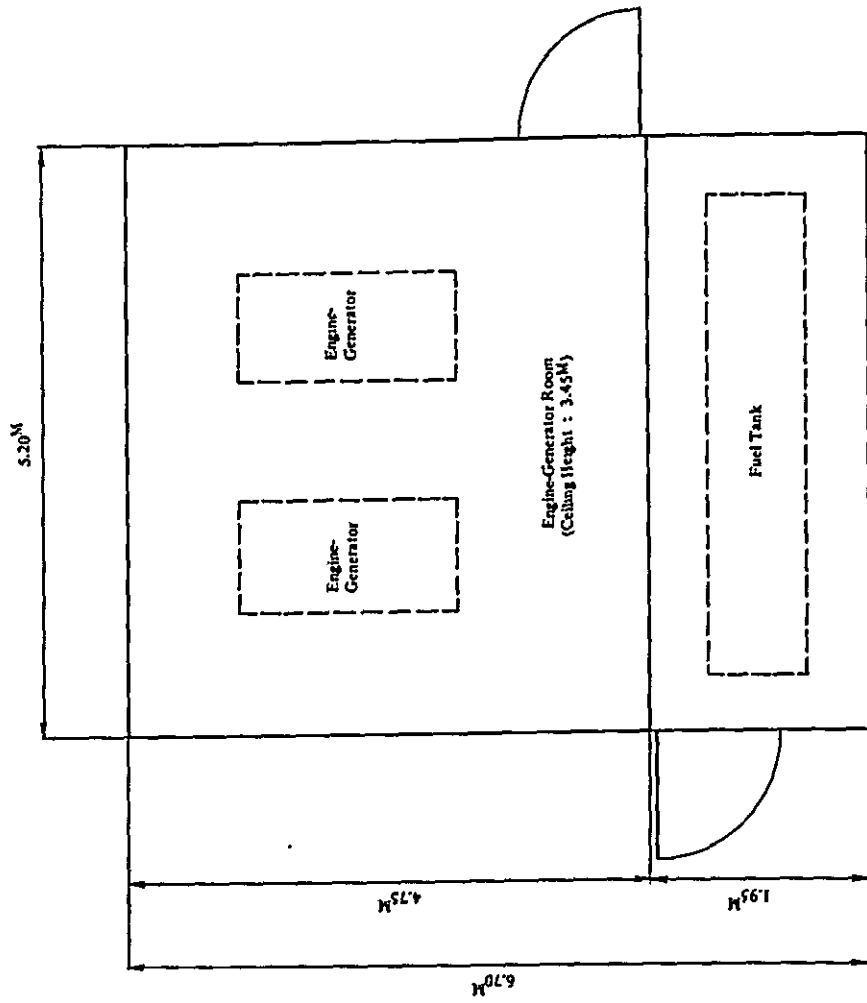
Floor Layout of Engine-Generator Room
